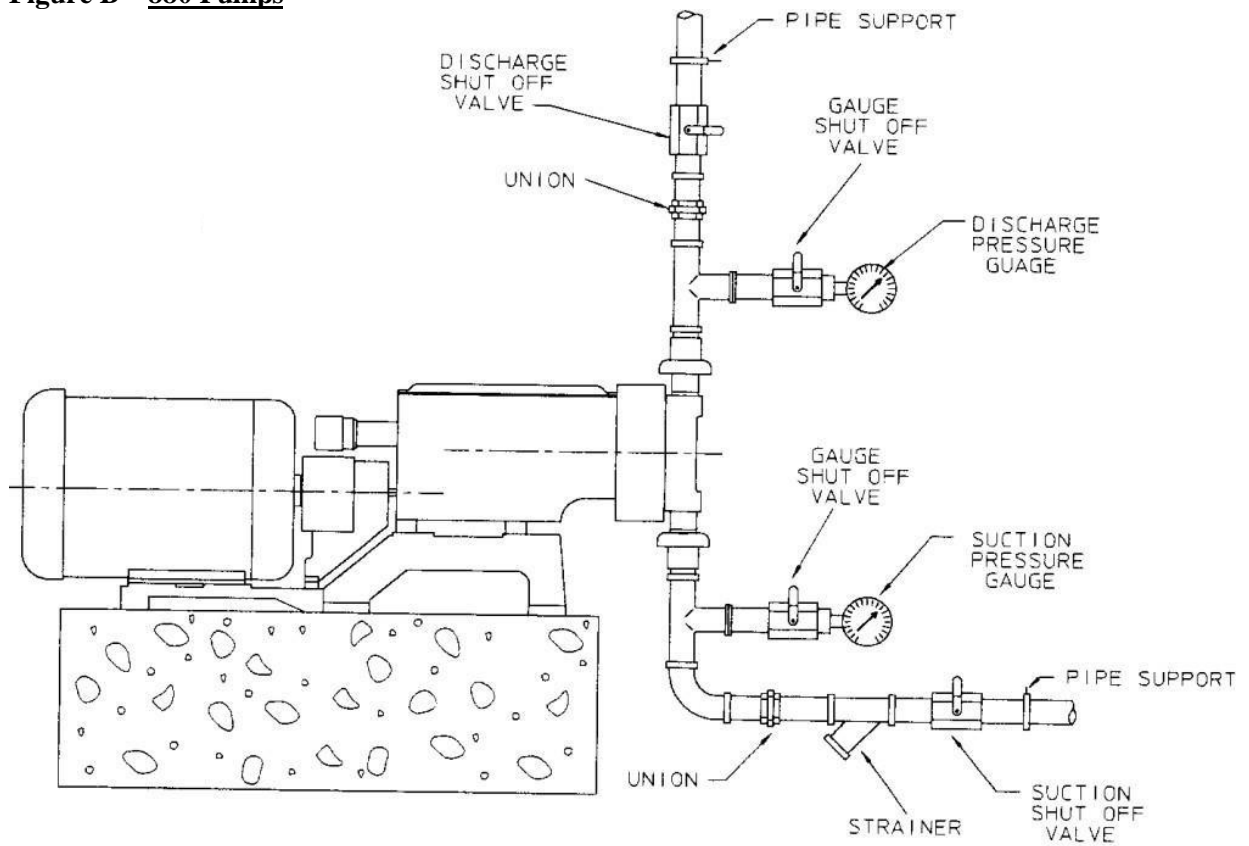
Pumps, Figure B – 880 Pumps, shows the preferred piping configuration for a good metering pump installation. A good piping installation addresses present and future requirements of the metering system.
